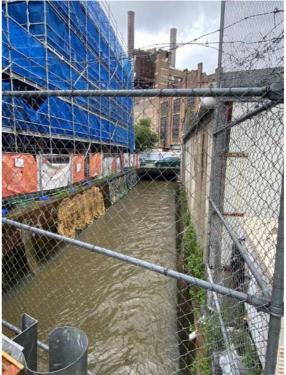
Photo looking south along the open stormwater channel toward the Power Station (Design 5, March 2022).
